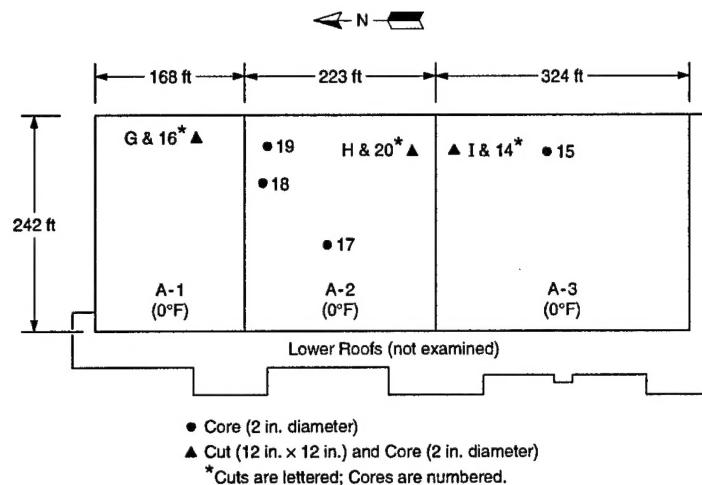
Plan view of the three roofs examined in Arlington, Texas.
